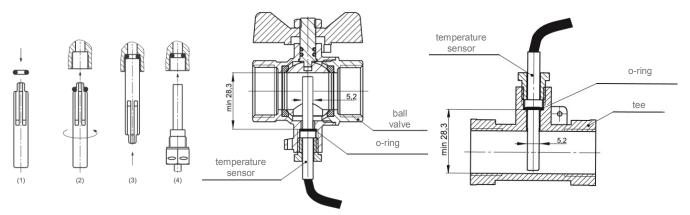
Installation of the o-ring and the temperature sensor in a ball valve or a tee.
